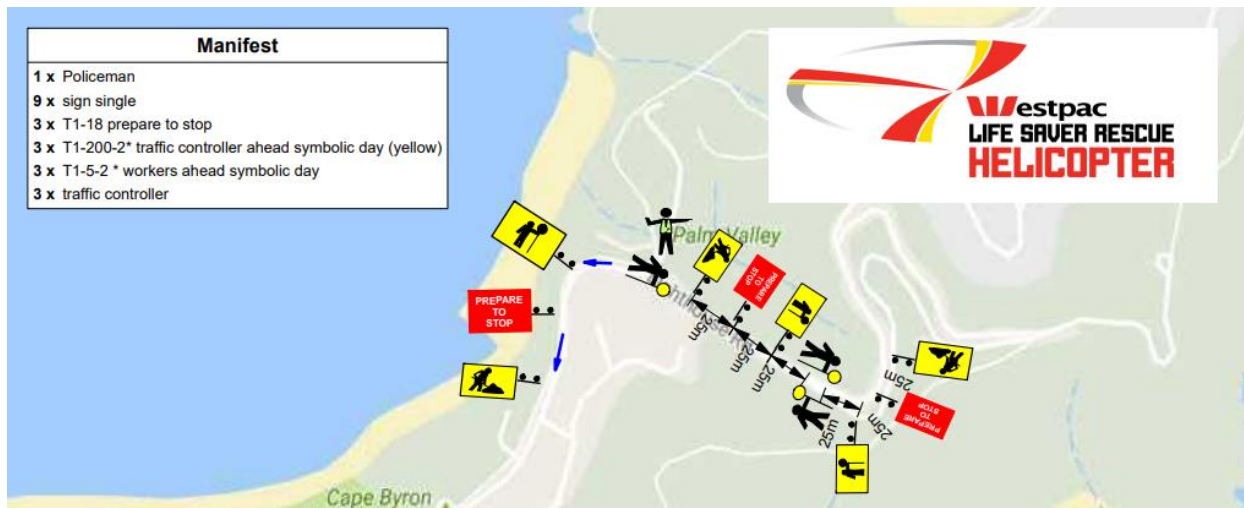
Traffic control proposed for eastern section Lighthouse Road. Coming down from Lighthouse Road (refer to Figure 1). Traffic control to be in place from 6am to 10.30pm.
